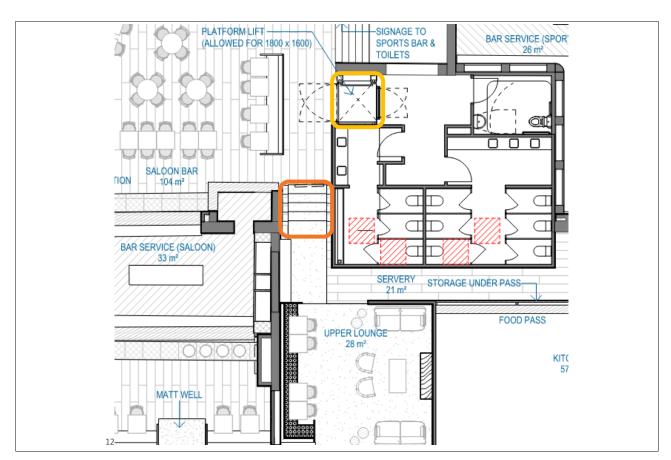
Snapshot from Architectural Plan of the Ground Floor detail with the stairway to the Upper Lounge highlighted in orange
